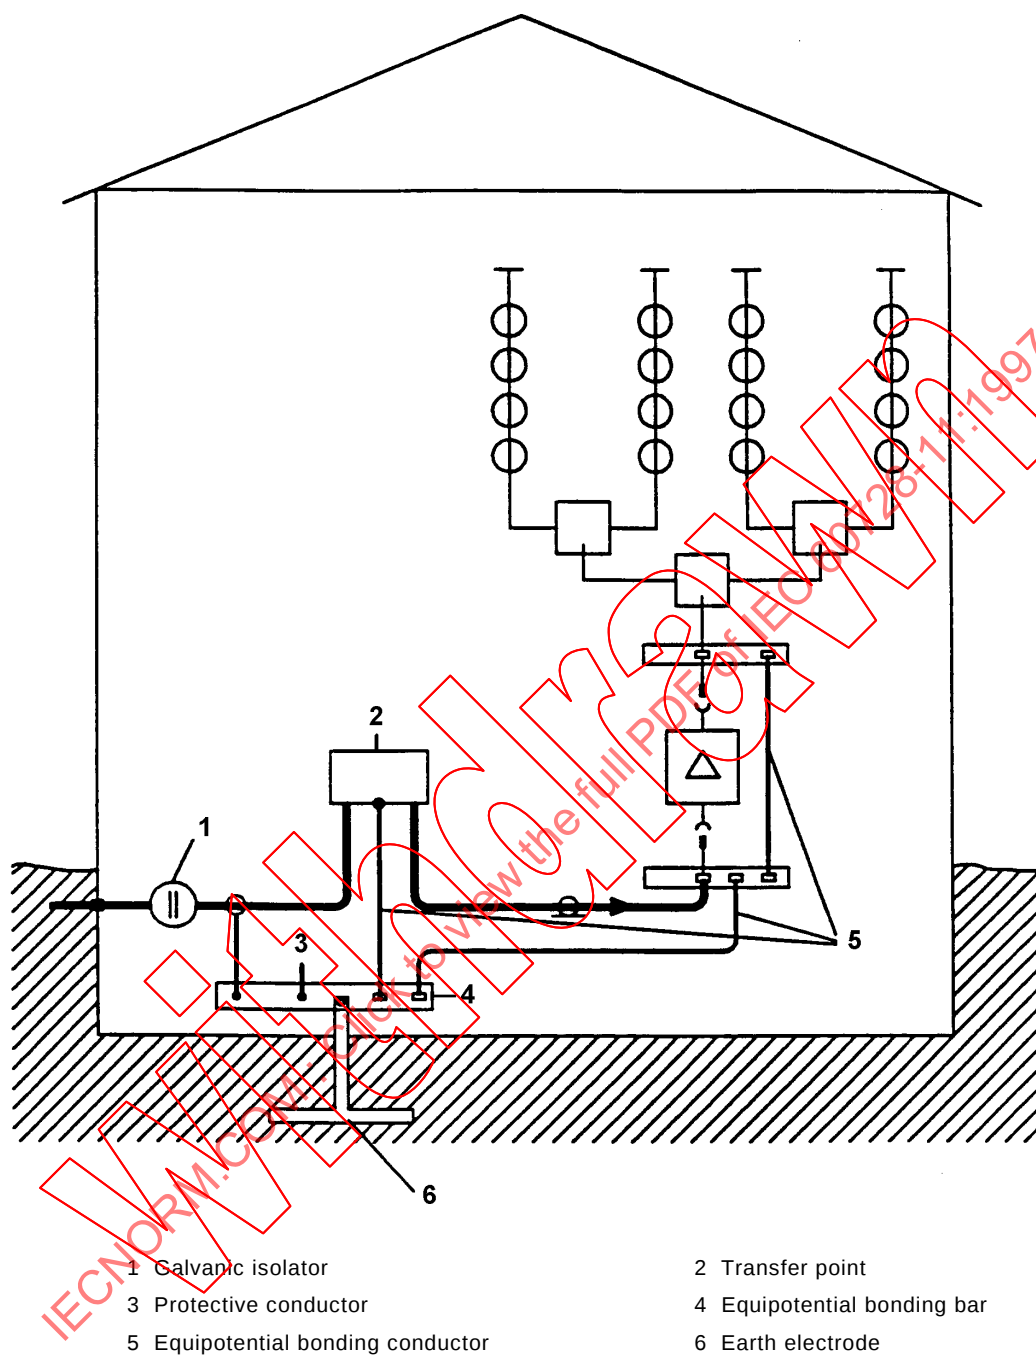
Example of equipotential bonding with a galvanic isolated cable entering a building (underground connection)
